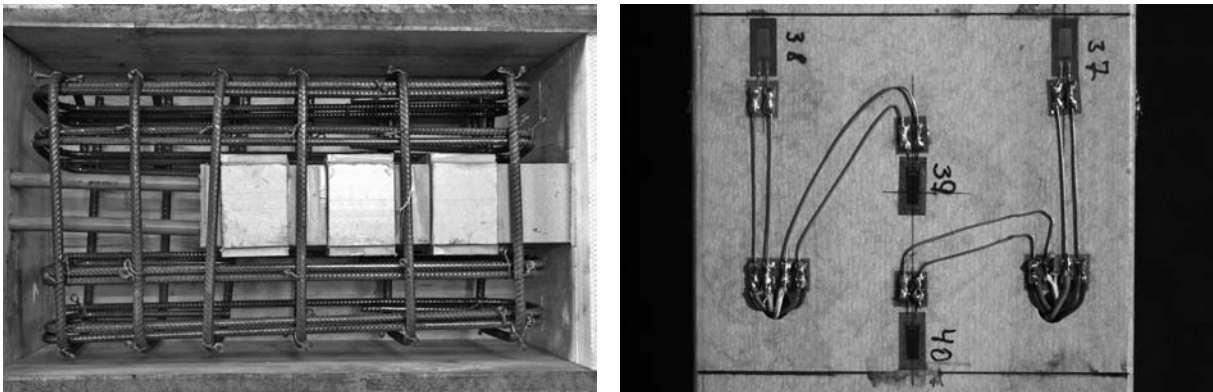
Reinforcement and dimensions of the all-GFRP beam specimen
